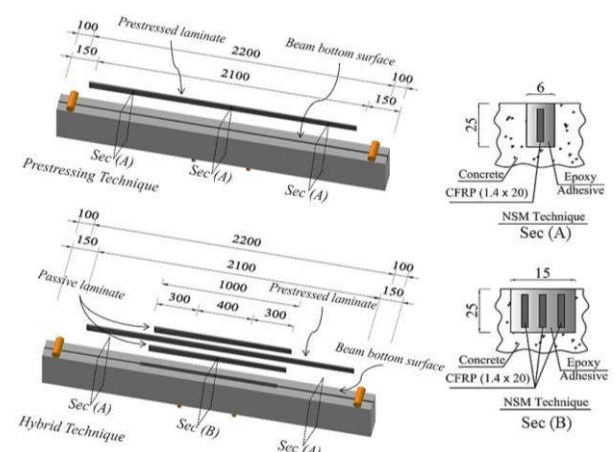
CFRP reinforcement details of hybrid and prestressing NSM techniques (dimensions in mm).
